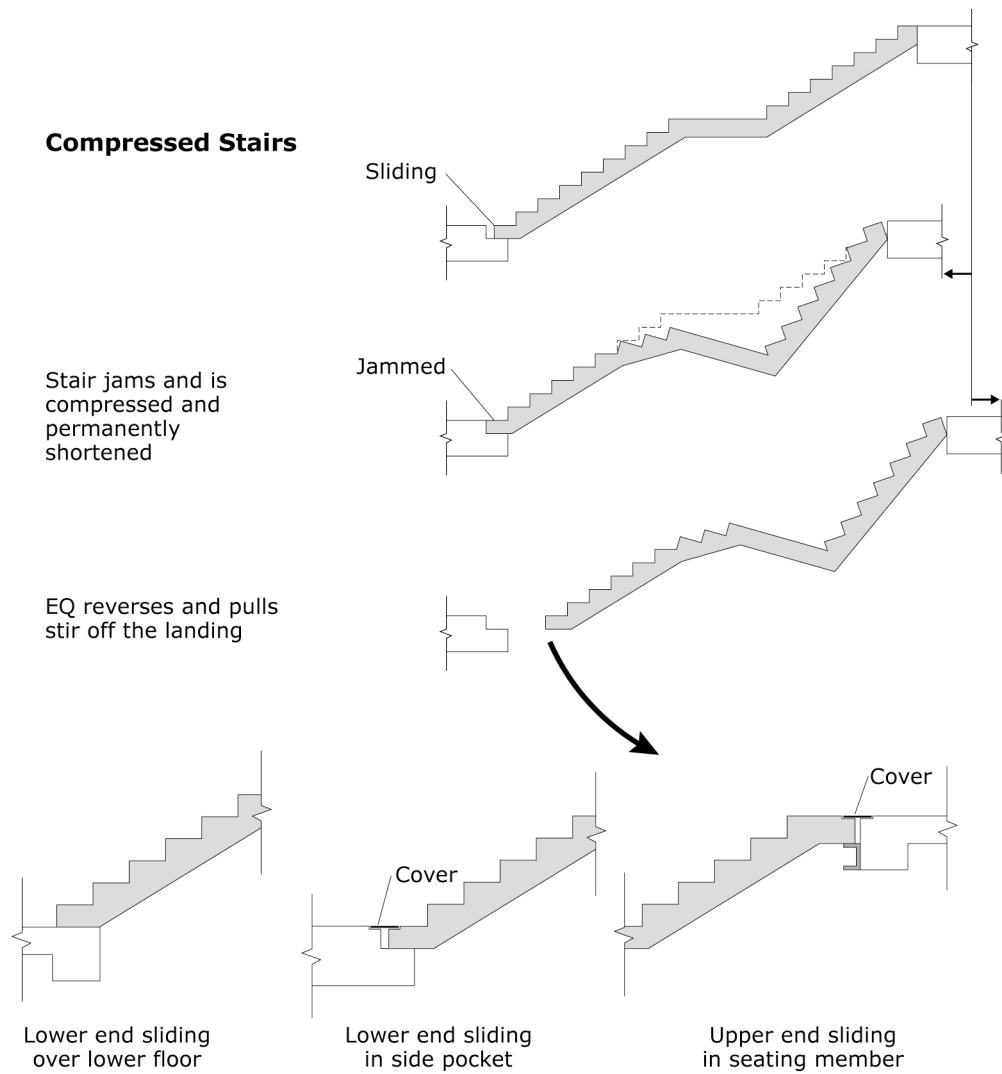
Figure showing how inadequate sliding surface can compress and then drop precast stair sections.
